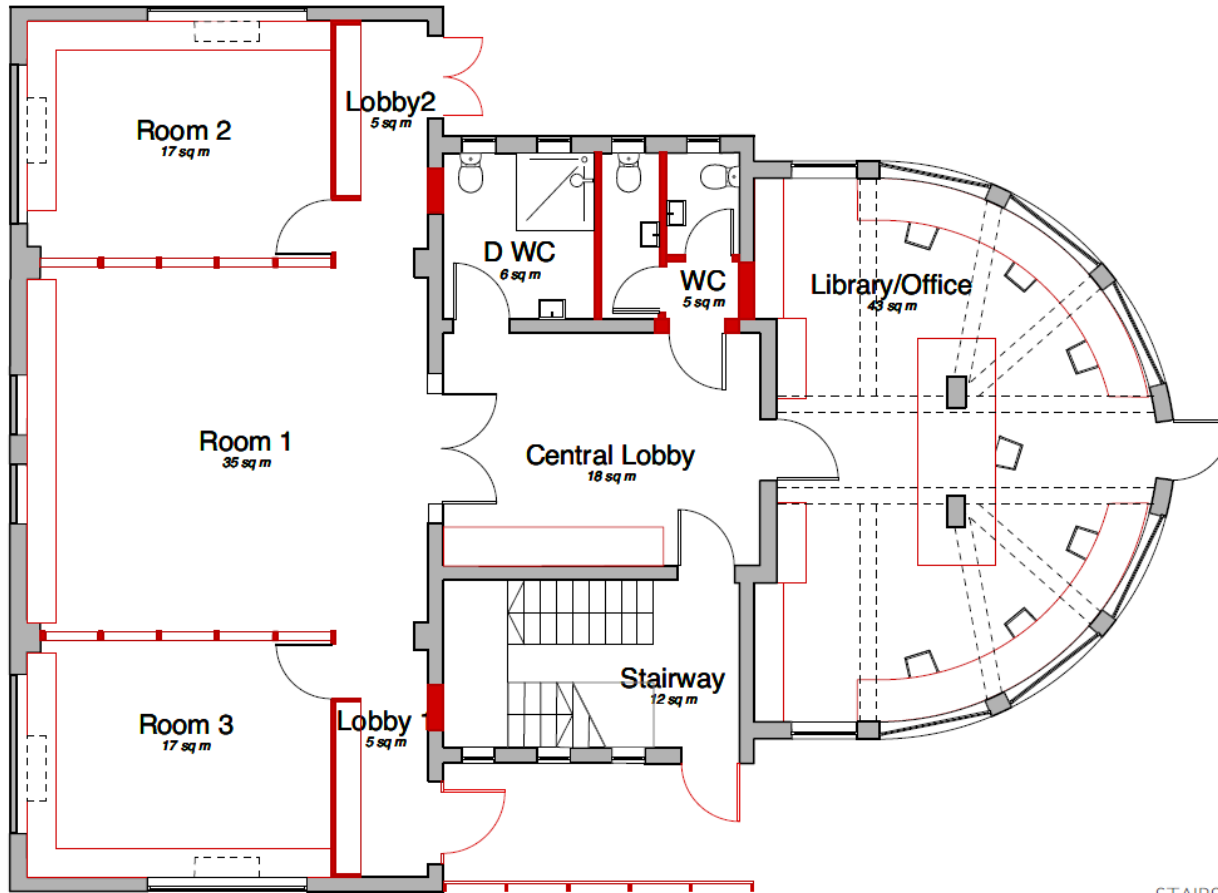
Drawing A –Existing layout for the community building in use by CASPr & NCCCAP.
